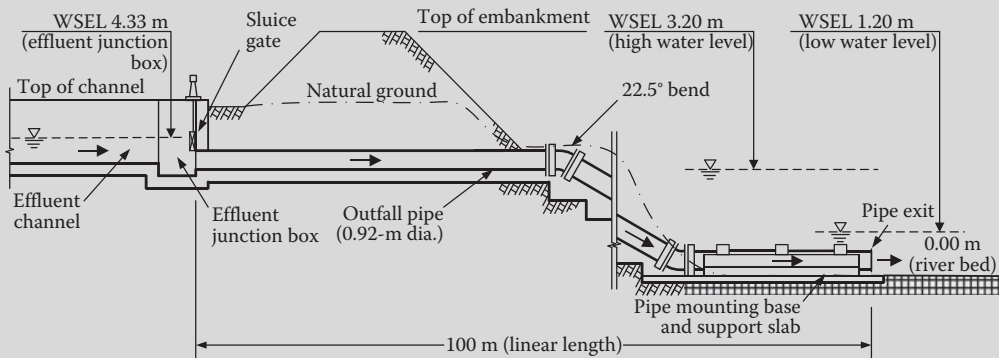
Conceptual side view of the outfall structure and hydraulic profile (Example 12.40).
